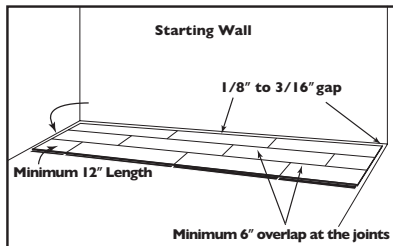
Stagger end joints by 6", cut pieces at ends of row should be 8" or greater.
